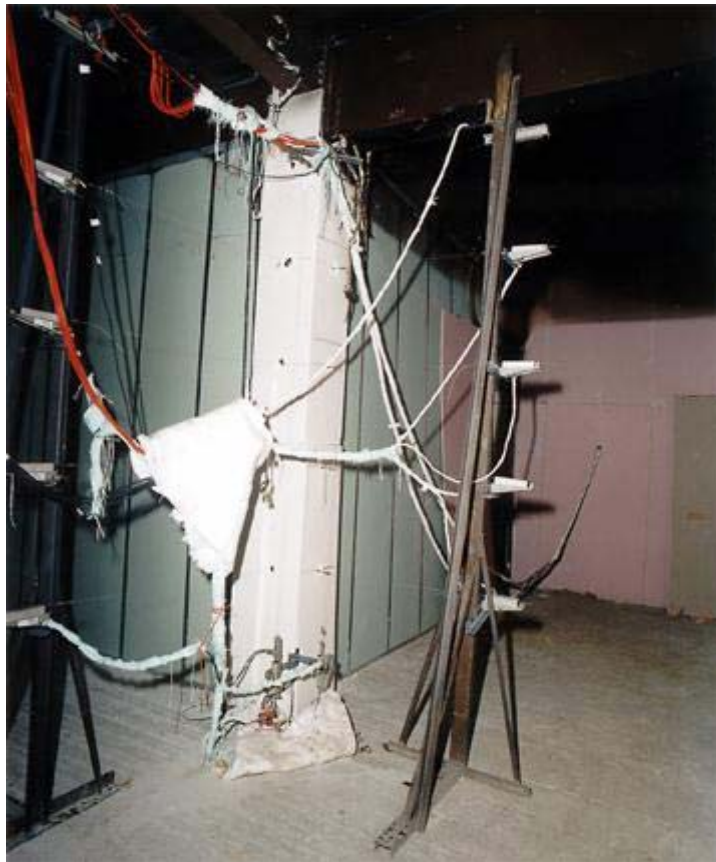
Compartment walls built to underside of main gridlines – BRE corner fire test
